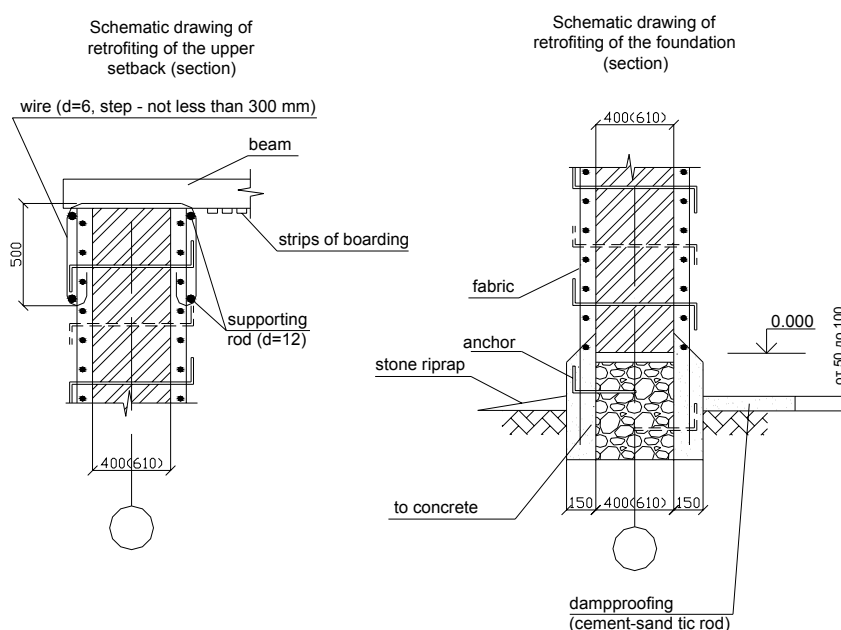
Retrofitting of walls of adobe brick house by the reinforcing fabrics in layer of high-strength mortar.
